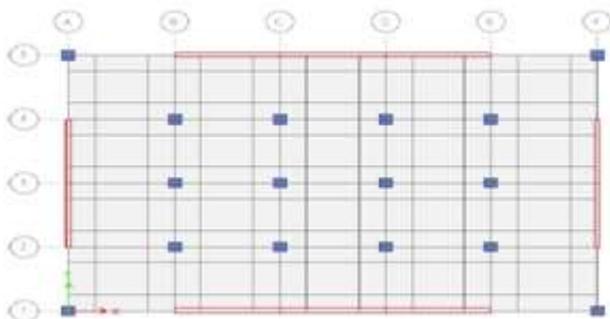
PLAN - FLAT SLAB WITH RECTANGULAR- SHEAR WALL
